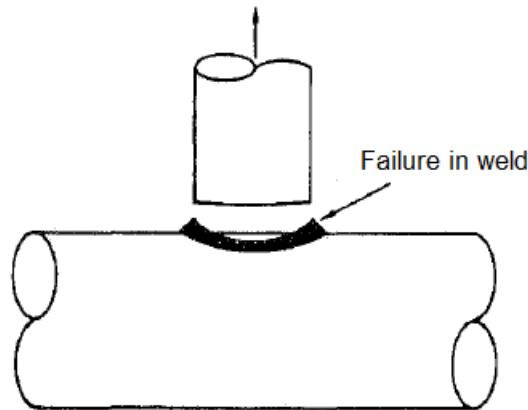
Failure in the weld (R. P. Pan *et al.*, 1977)
